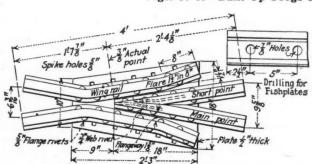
No. 3 STIFF FROG FOR 40-LB. RAILS RAIL—3½-in. 40-lb. A.S.C.E. section, first quality. Drilled 2½ in. x 5 in. — 1-in. holes. FLANGE RIVETS—1-in. diameter, 34 total, to be spaced about as shown. To be countersunk on bottom, flush with plate.
